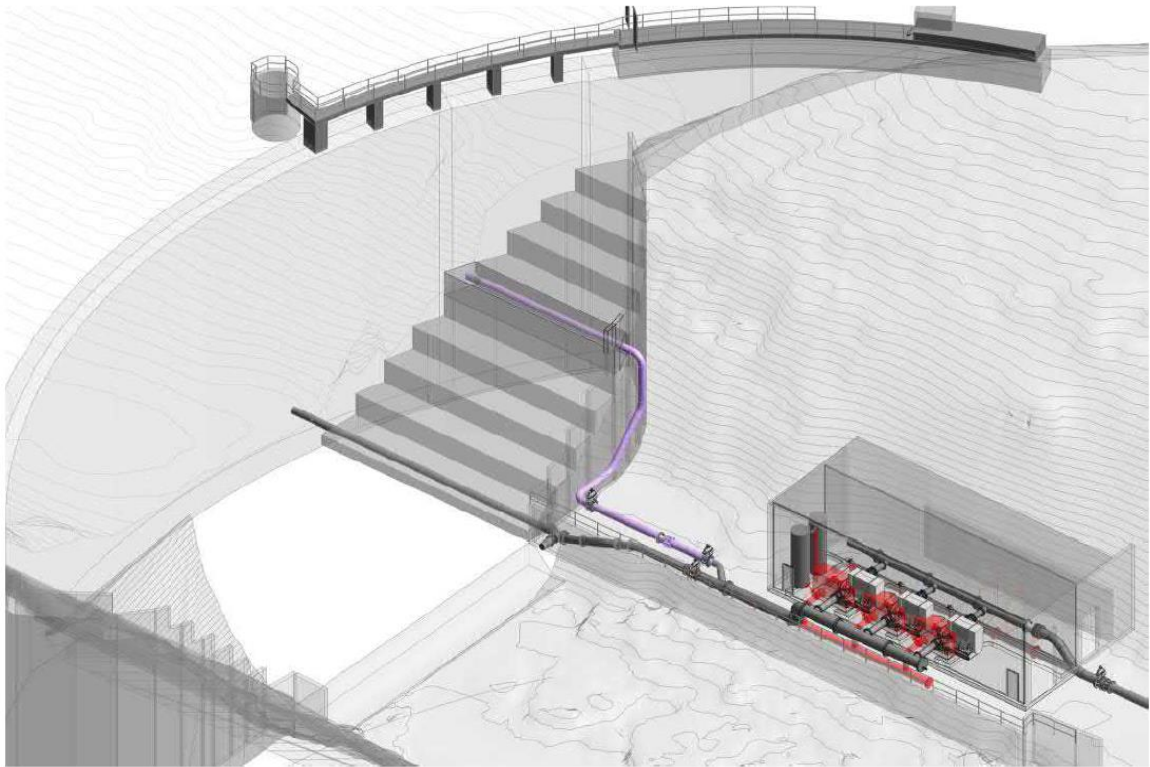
3D Model of proposed upgrade to Upper Mooney Dam Water Pump Station
